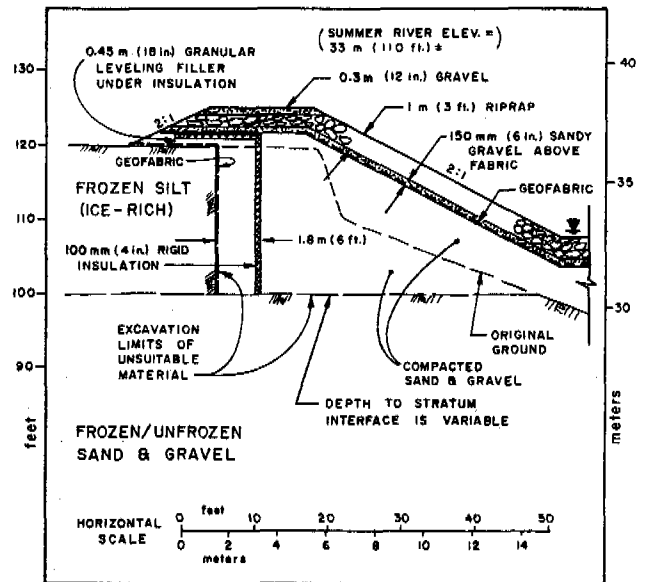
Typical Embankment Section For High Thaw Strain Soil
